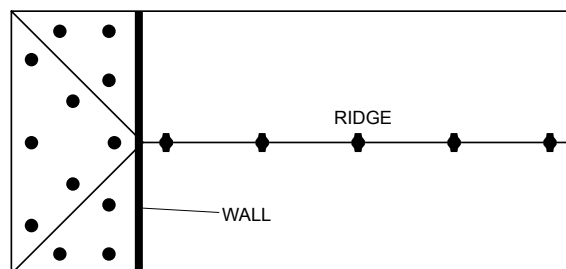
C-1. SD Sprinklers & Standard Spray Sprinklers At The Ridge
